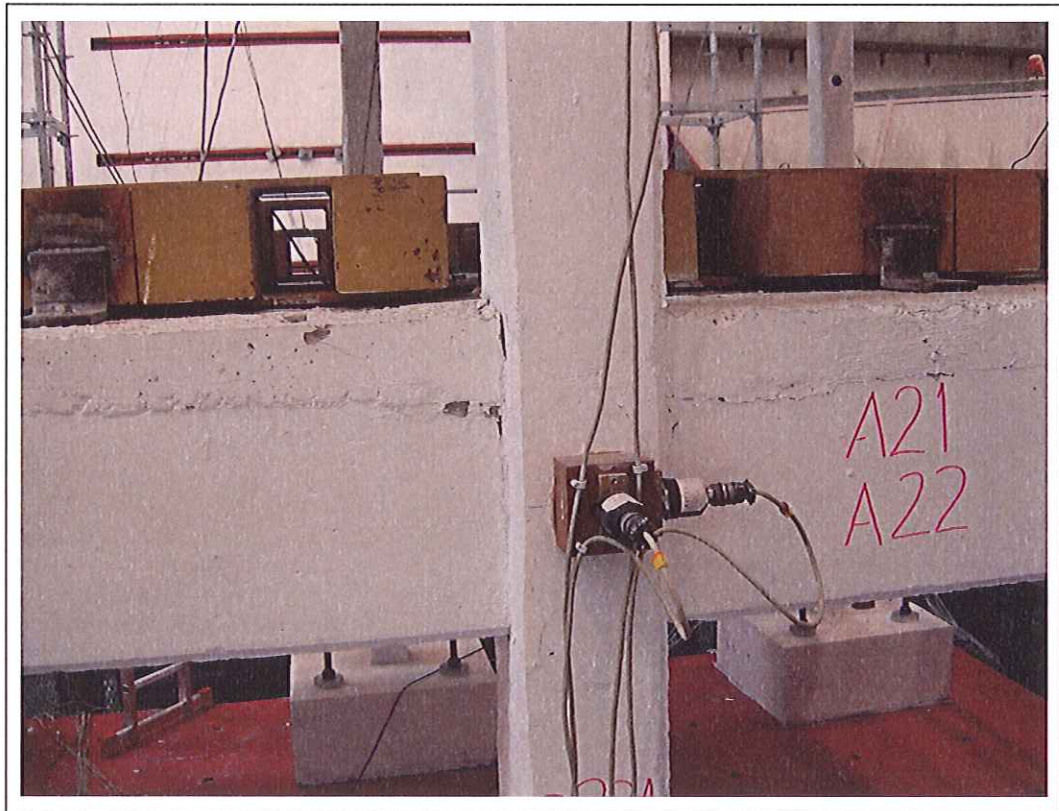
Detail of the beam-column connection after the test (J5-Long.)
